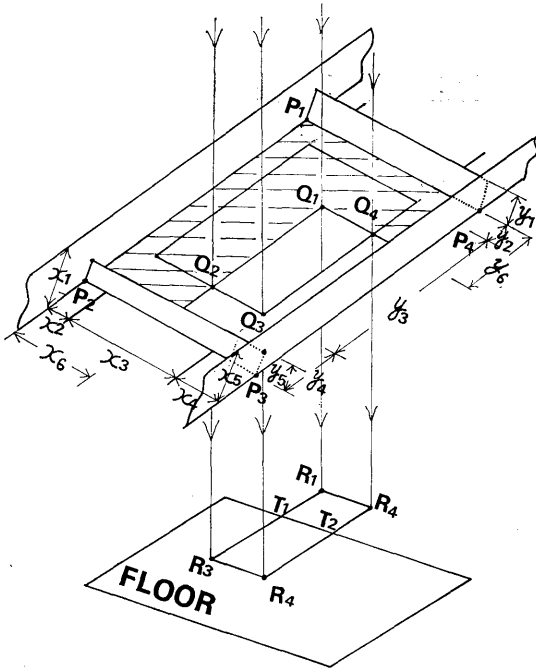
Schematic illustration of a fundamental element (a frame with a glass sheet) constructing greenhouse walls.
